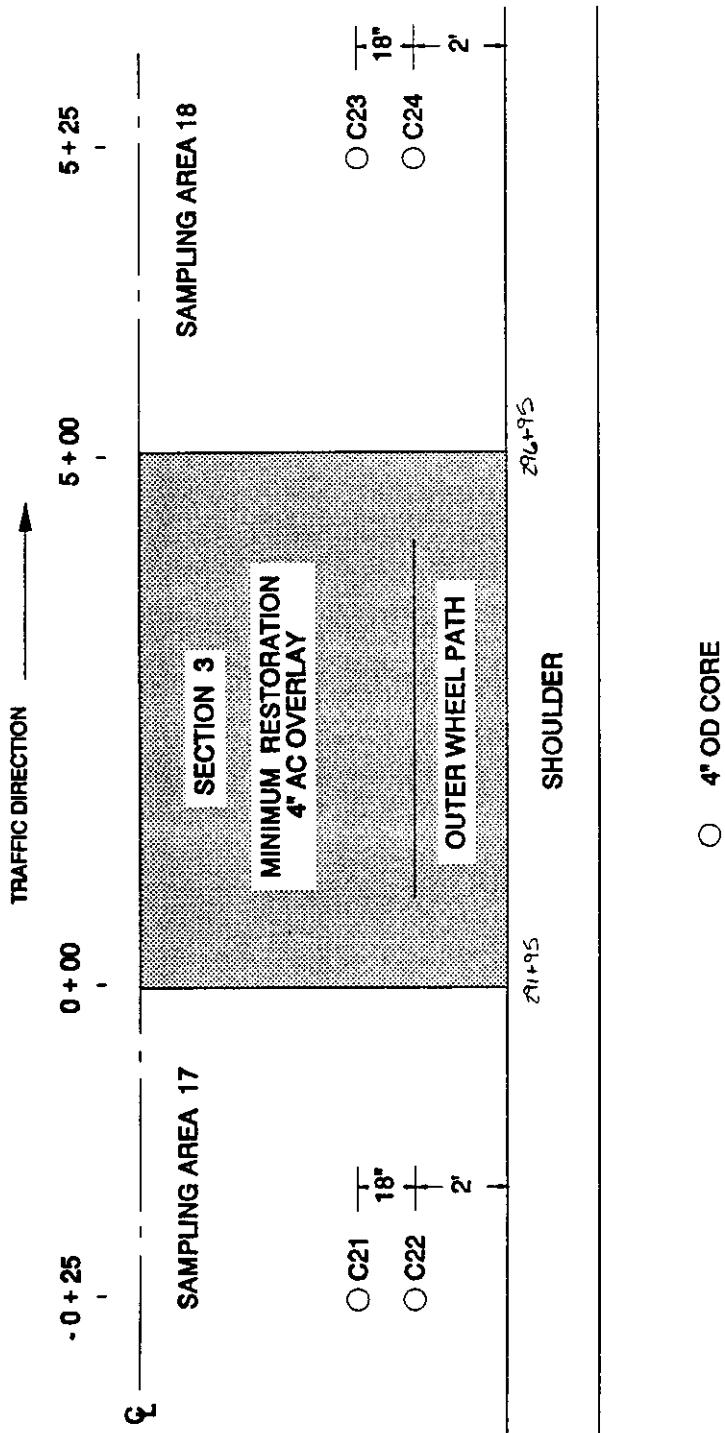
Example of "Post-Construction" Sampling Plan for Test Section 3
